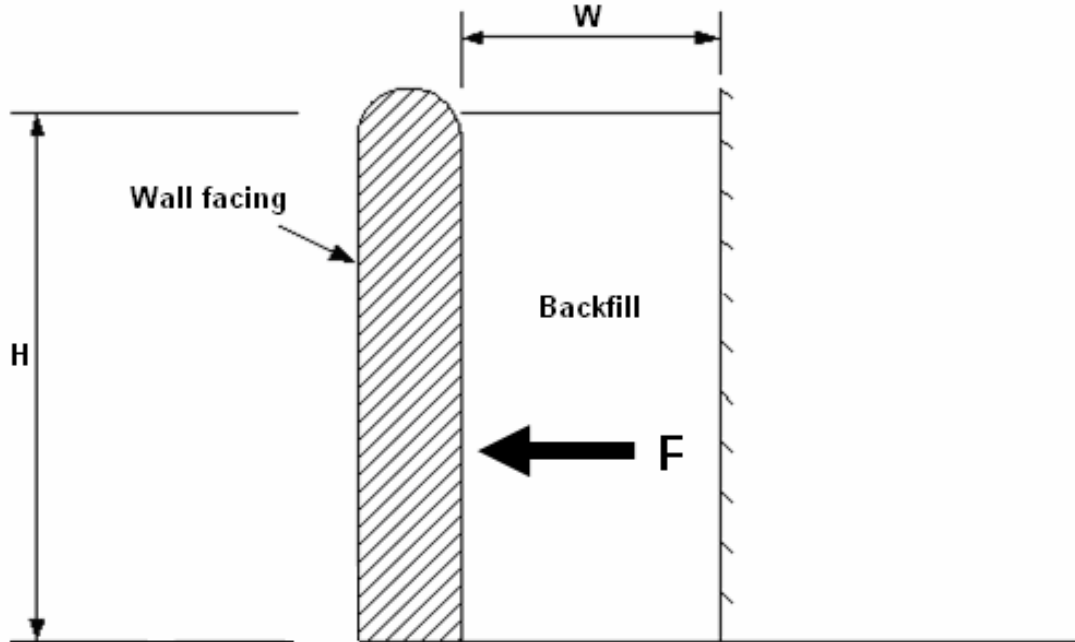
Schematic showing location of total force ( $F$ ) acting on the wall facing of a retaining wall.
